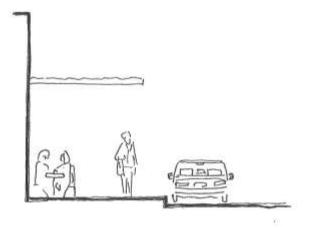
Cross section of alfresco dining on arterial/collector roads
